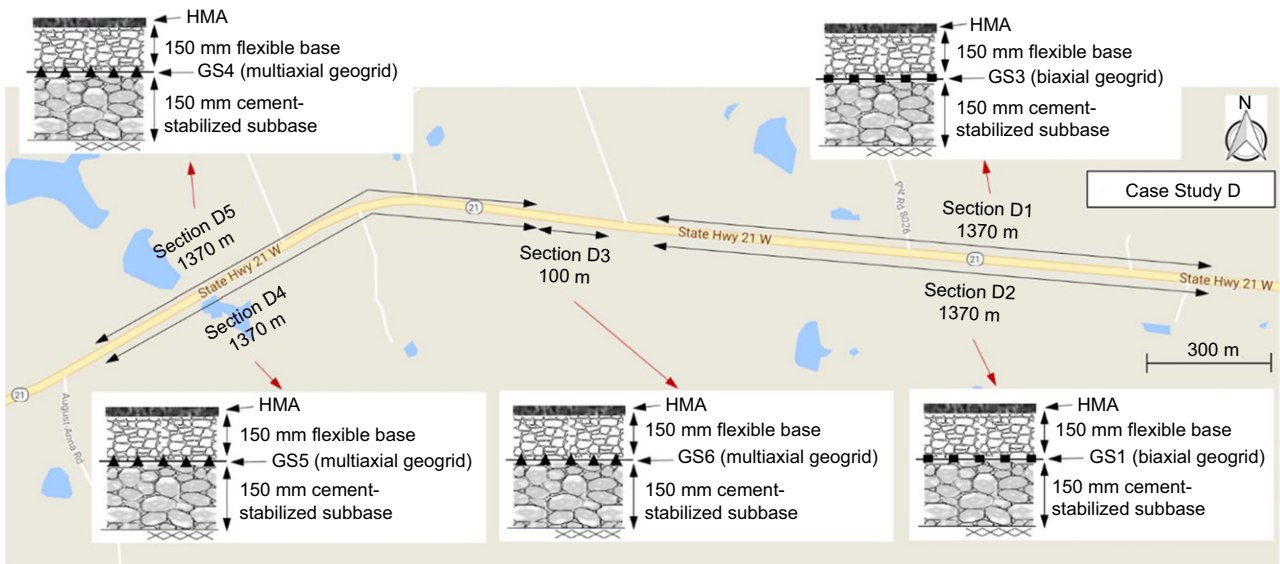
Layout of SH21 test sections and road profiles (Case Study D)
